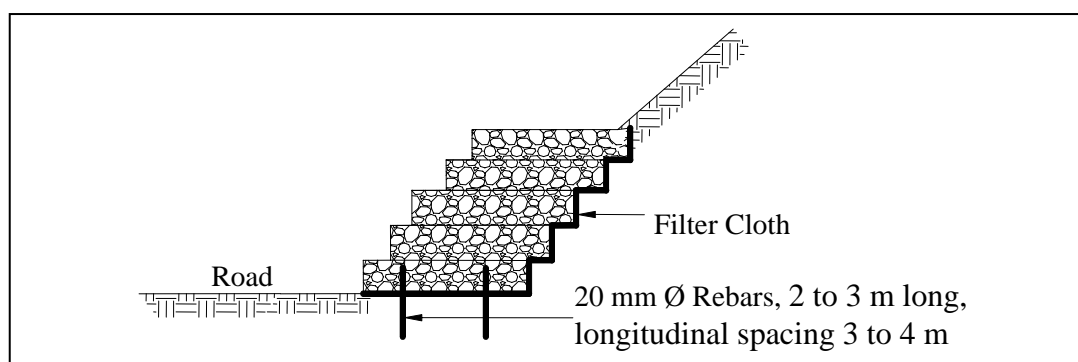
Example of Gabion Wall on the Foot of a Slope
